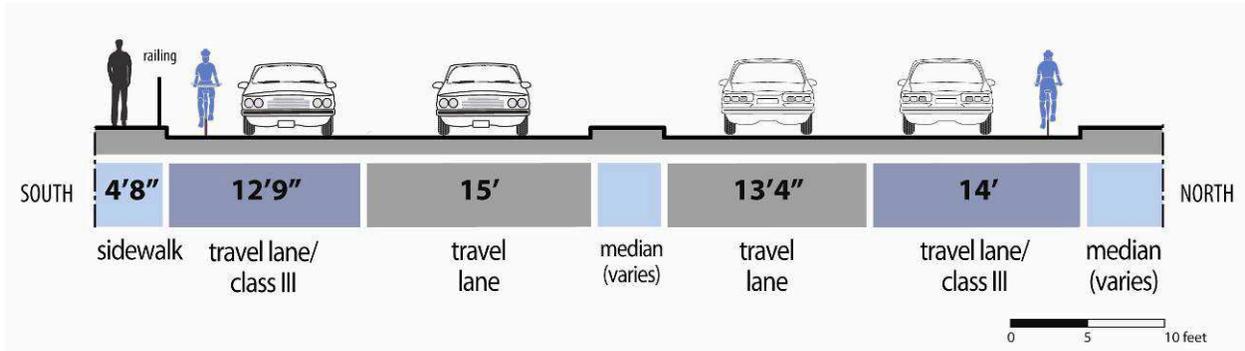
Second Street (Approximately 25' East of Ida Street Intersection)
